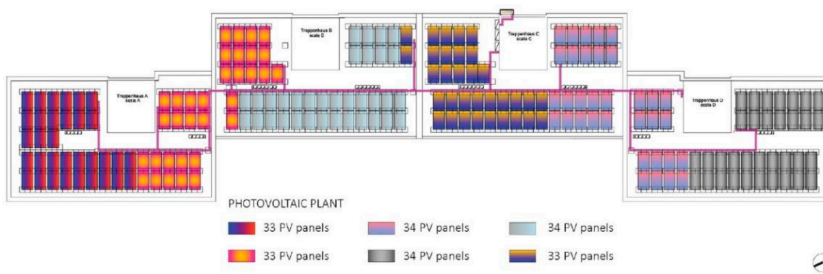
Technical plan of PV system on the roof of the north building (source: © EQ Ingegneria).
